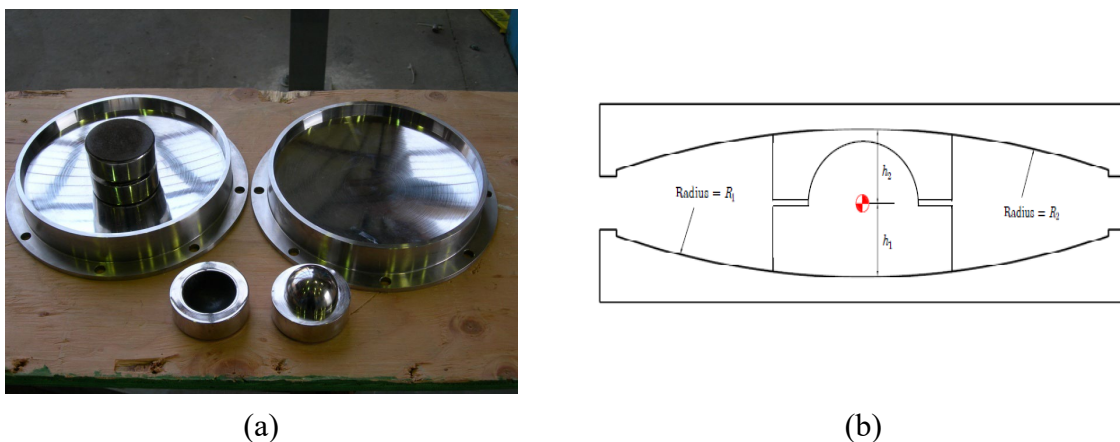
Double pendulum bearing (a) Disassembled and (b) Section view (Morgan and Mahin, 2011).
